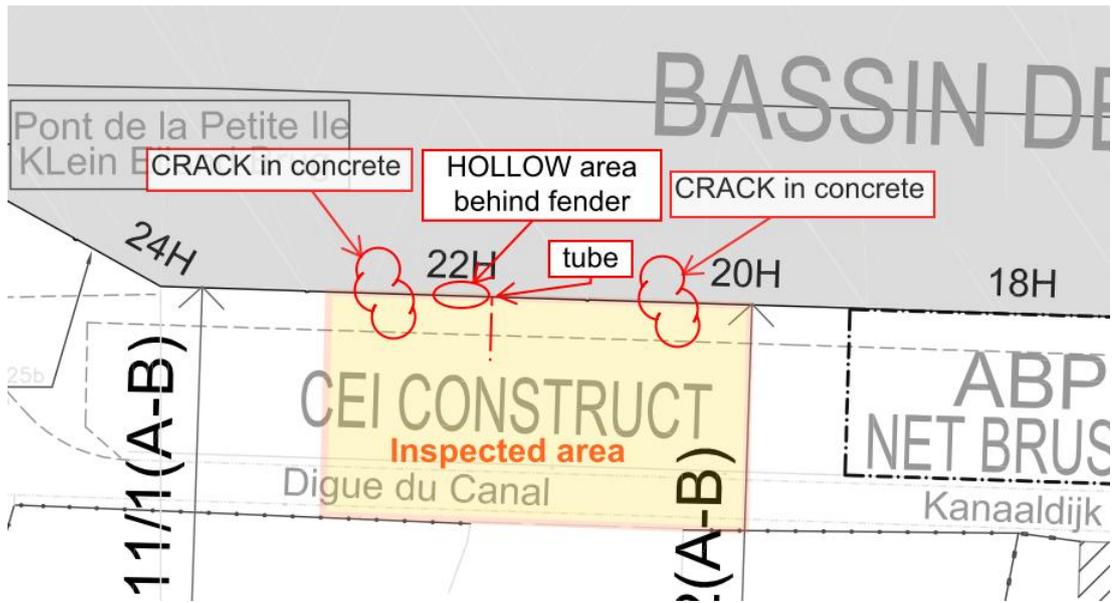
Visual inspection quay wall Biestebroeck Dock – visual inspection site (source: Technum)
